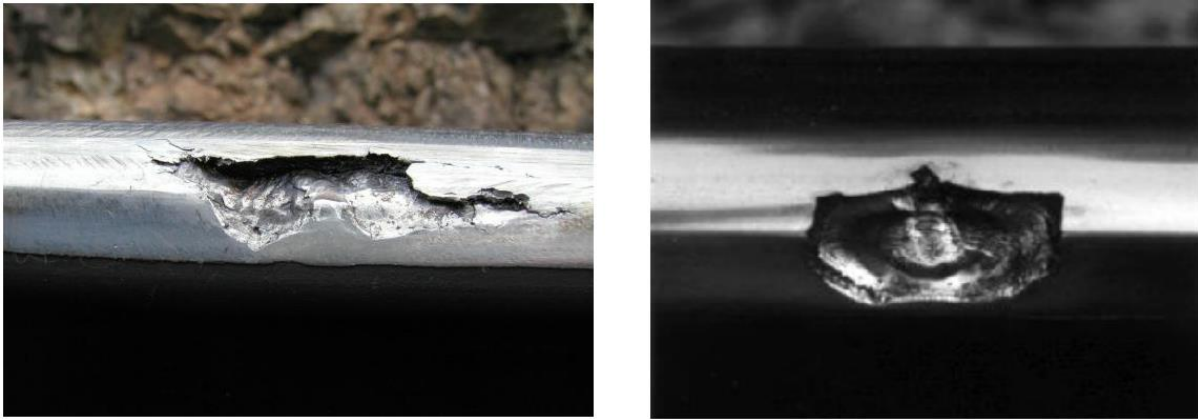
Examples of shelling from gauge corner collapse on rail steels [121].
